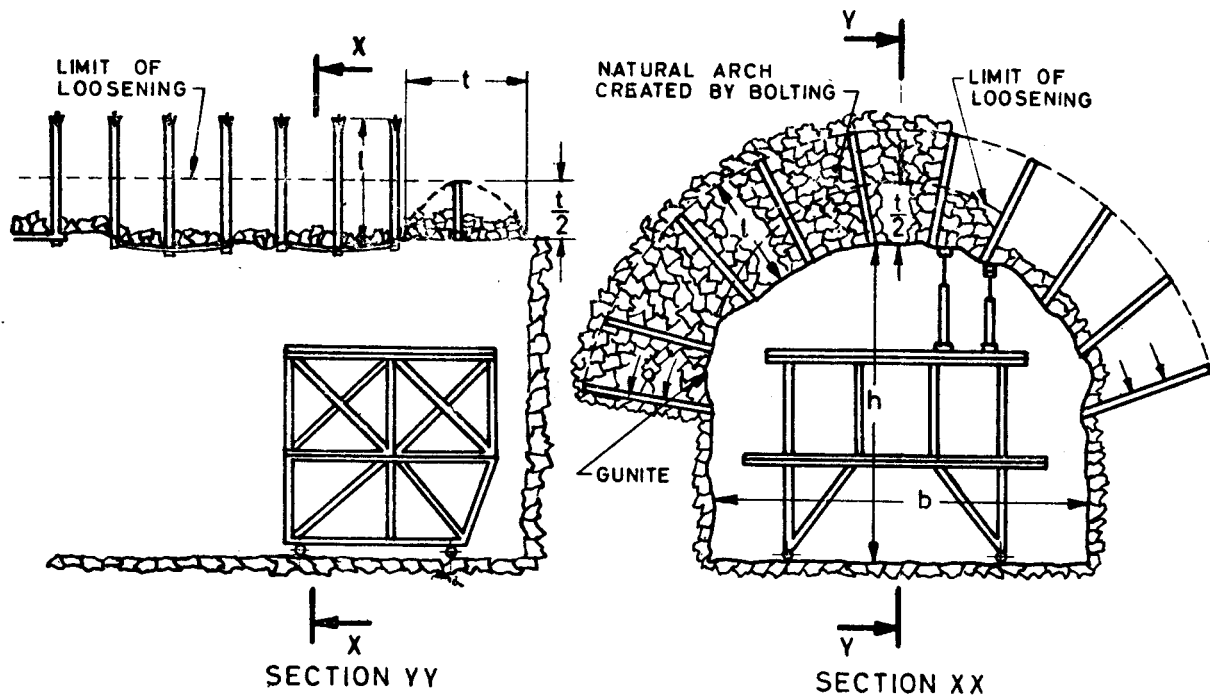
DIAGRAMMATIC SECTIONS DEMONSTRATING PRINCIPLES OF ROOF BOLTING
